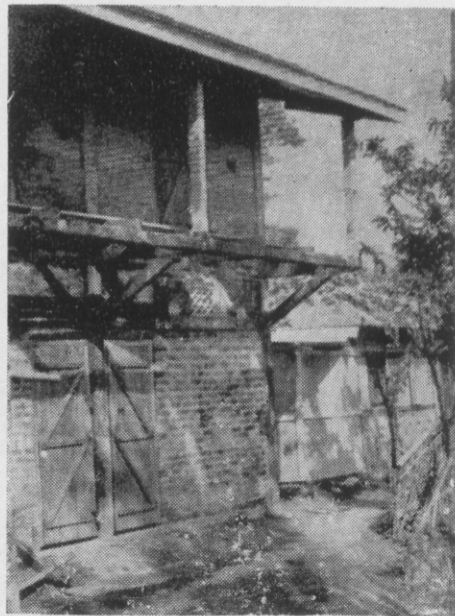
Separation of column from the wall and collapse of the backyard wall in brick masonry.
